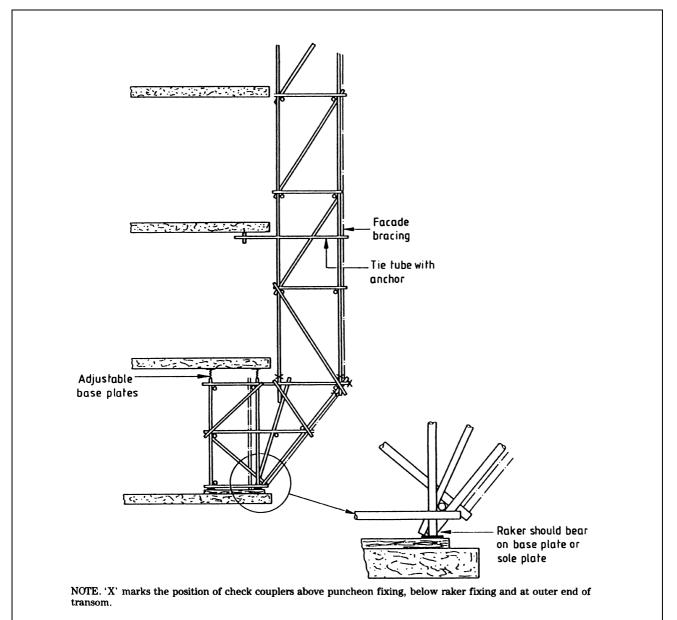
Typical truss-out independent tied scaffold (on building under construction)
